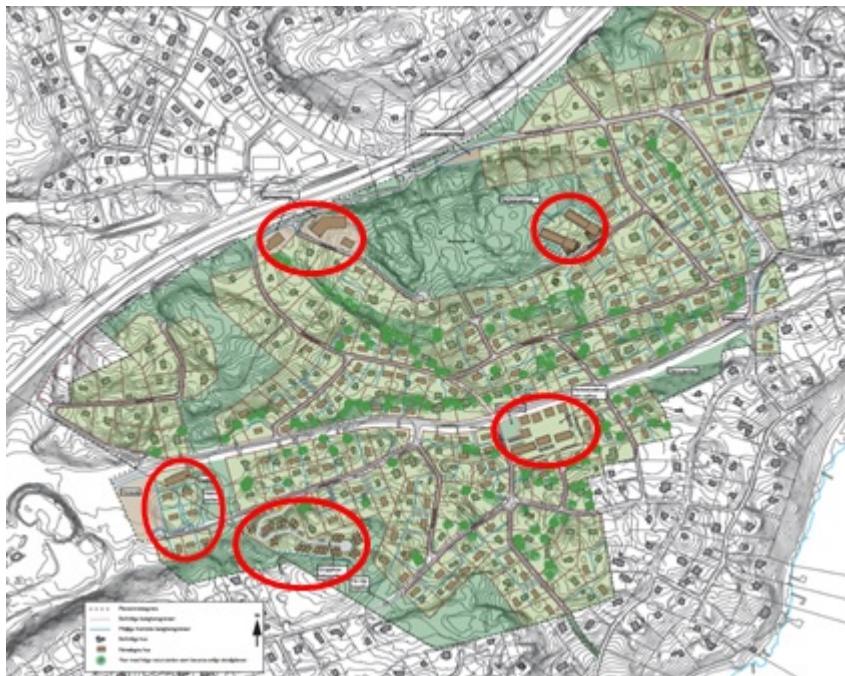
project of the area: in grey the existing houses, in brown the future houses. The major buildings are highlighted with the red circles.
